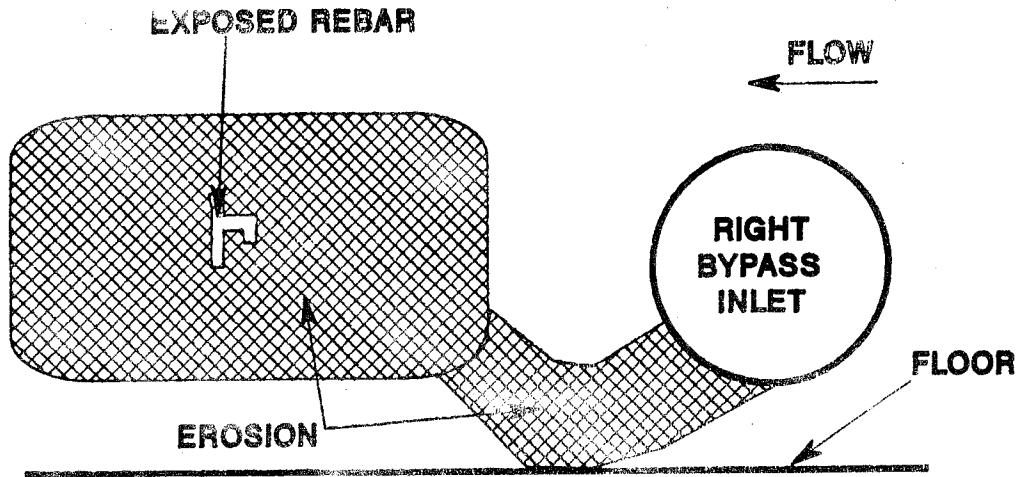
Sketch of cavitation damage in wall of right passage, Cave Run Dam, 1982
